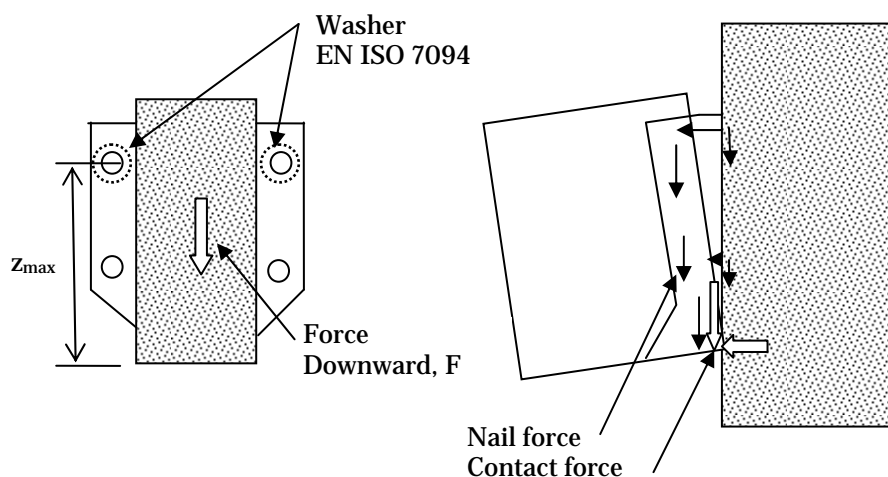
Left: Cross section in joist. Right: The joist will deflect and rotate, at the bottom a contact force will occur at the bottom plate, and the withdrawal forces in the bolts in the wall will vary linearly as assumed for a nailed connection in the header.
